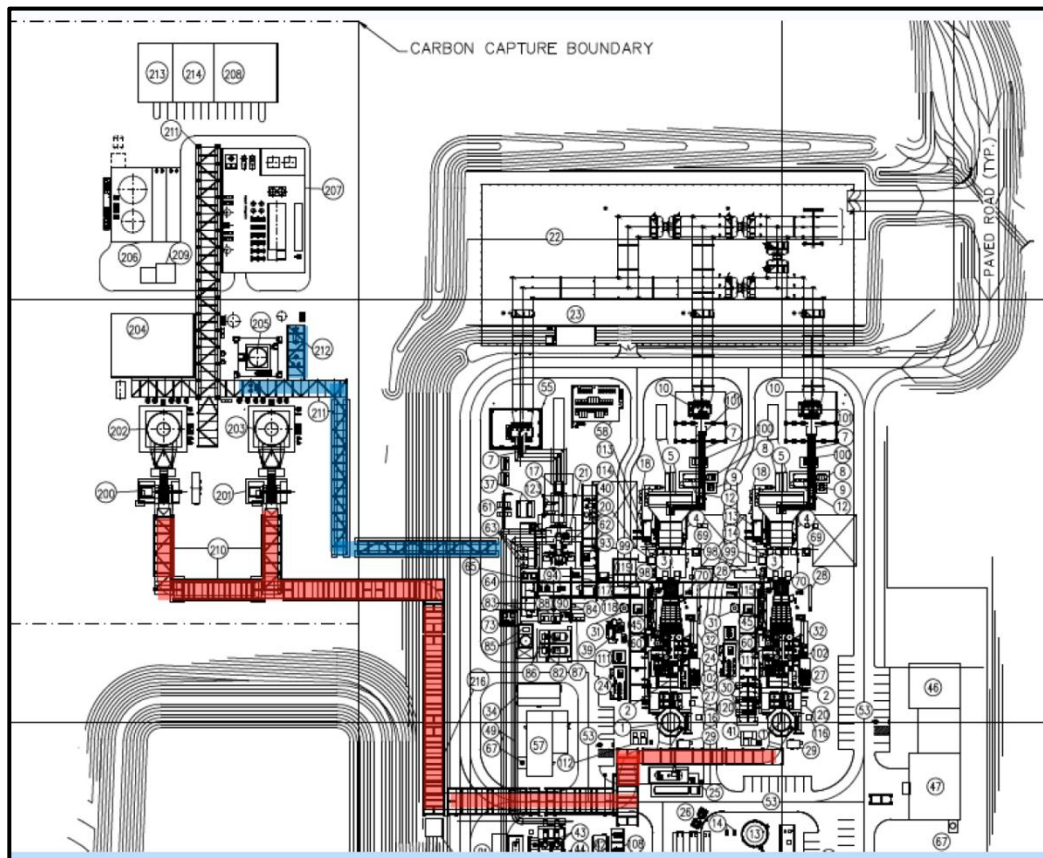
Plan Depicting CCUS Footprint: Panda Power
